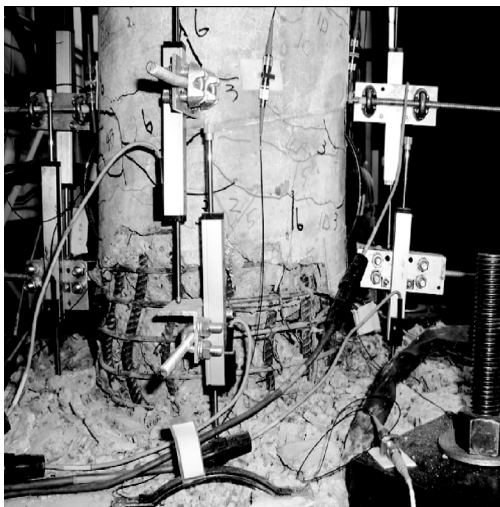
Damage to bridge pier at bent 1 after ground shaking level 5.
